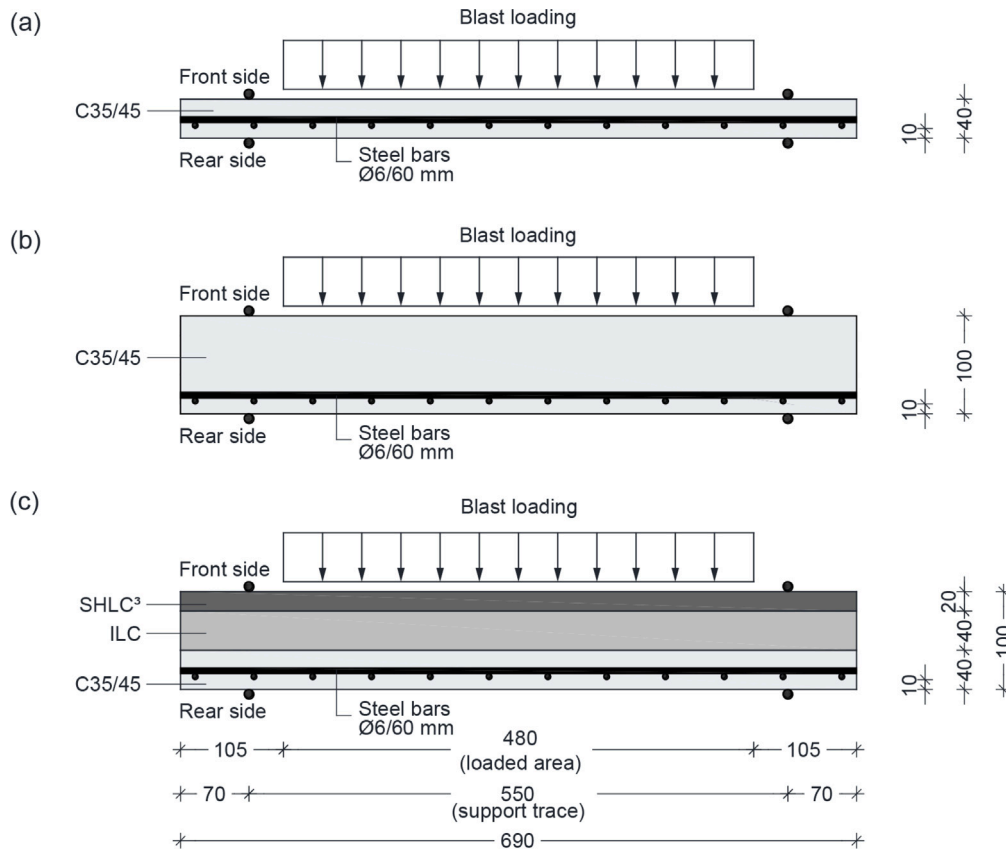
Specimen dimensions: (a) 40 mm thick RC specimens (RC-40); (b) 100 mm thick RC specimens (RC-100); (c) 100 mm thick layered specimens (LAY) (dimensions in mm).
